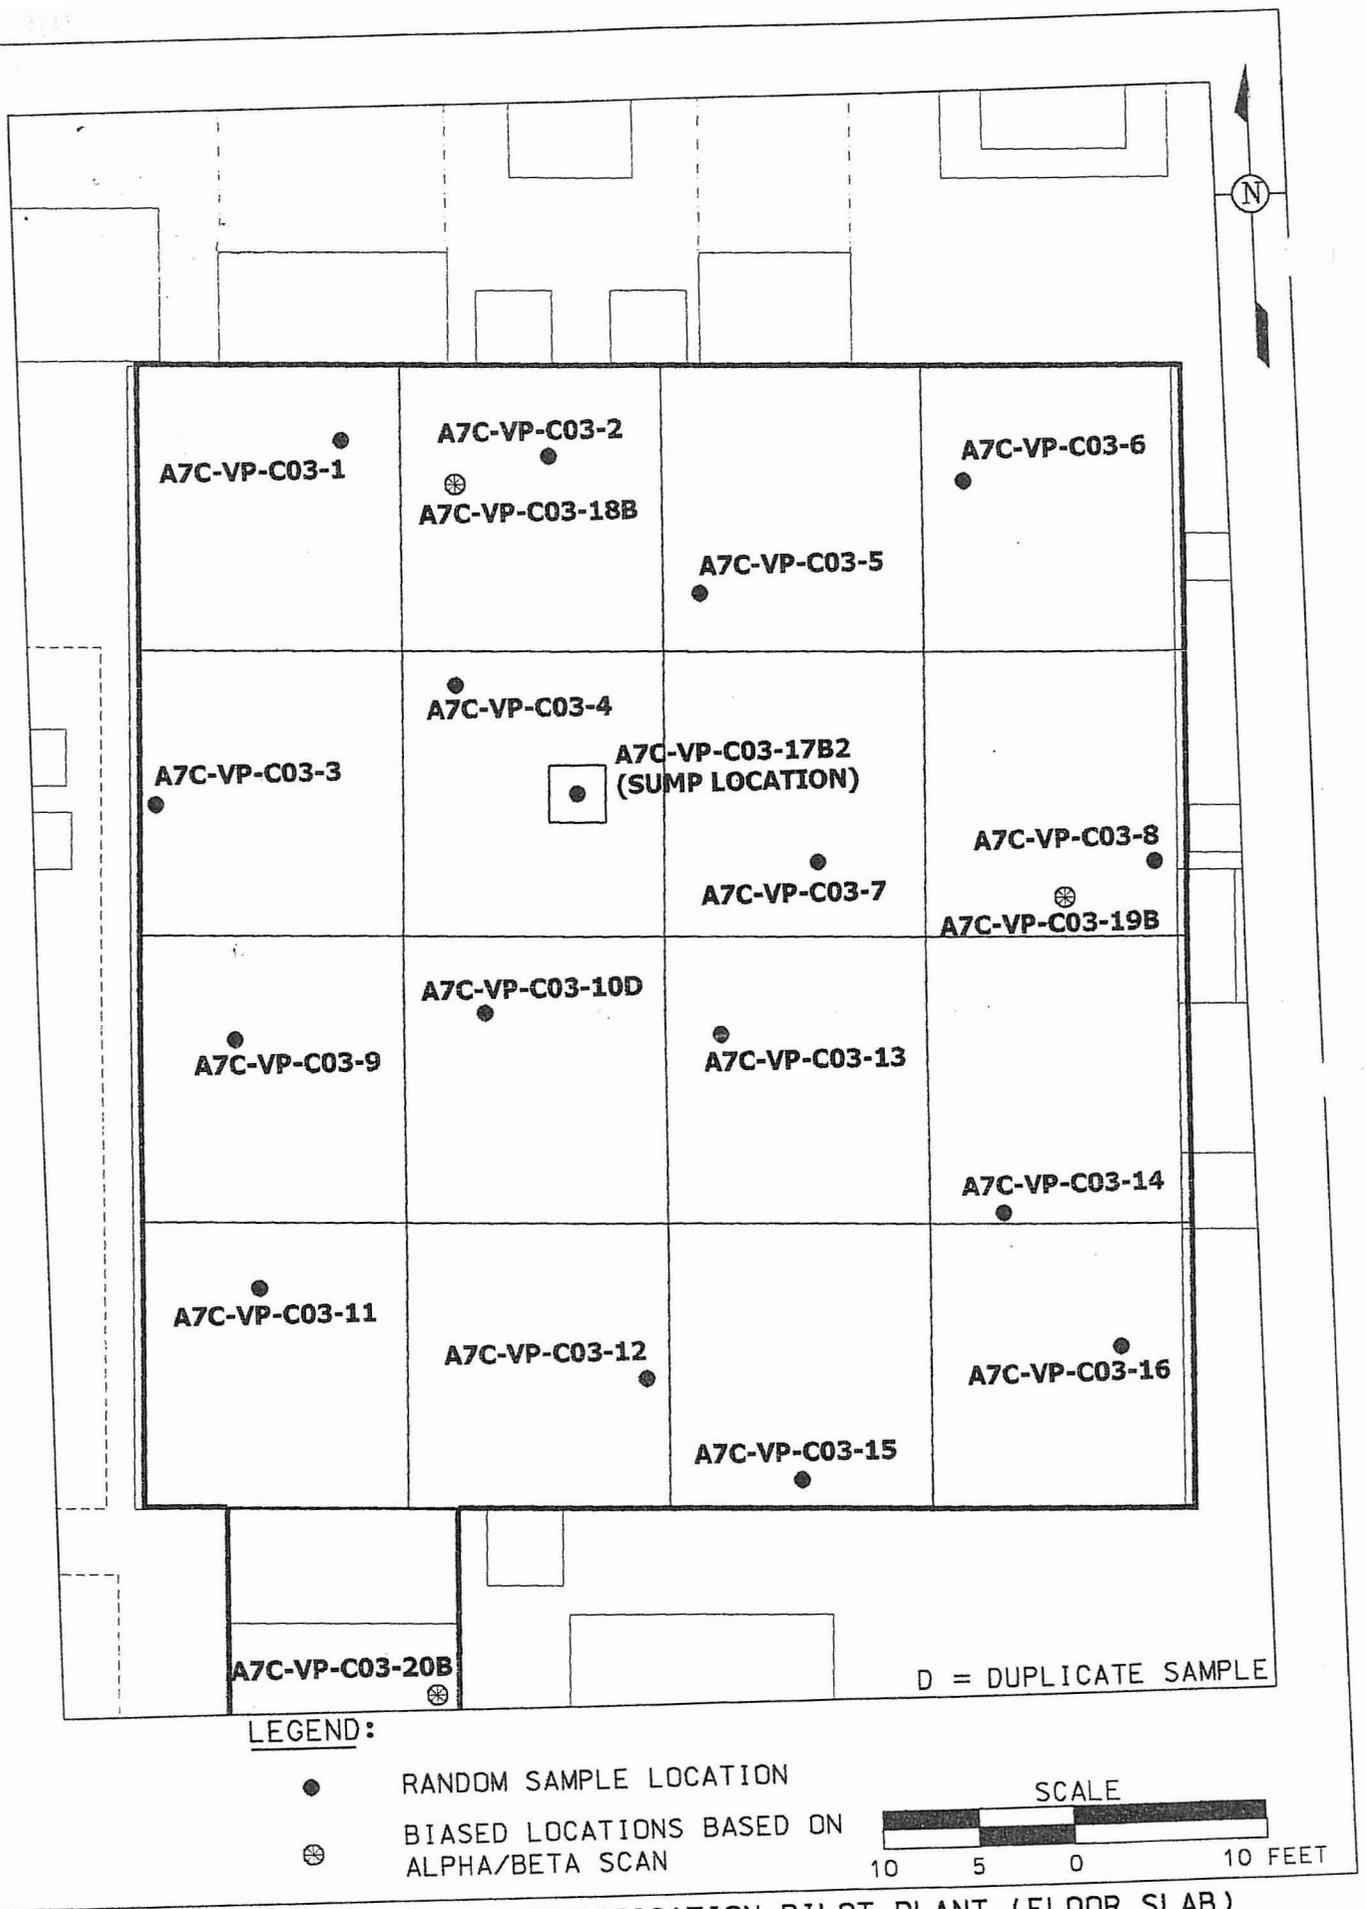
AREA 7 VITRIFICATION PILOT PLANT (FLOOR SLAB) CERTIFICATION SAMPLE LOCATIONS (CU A7C-VP-C03)
